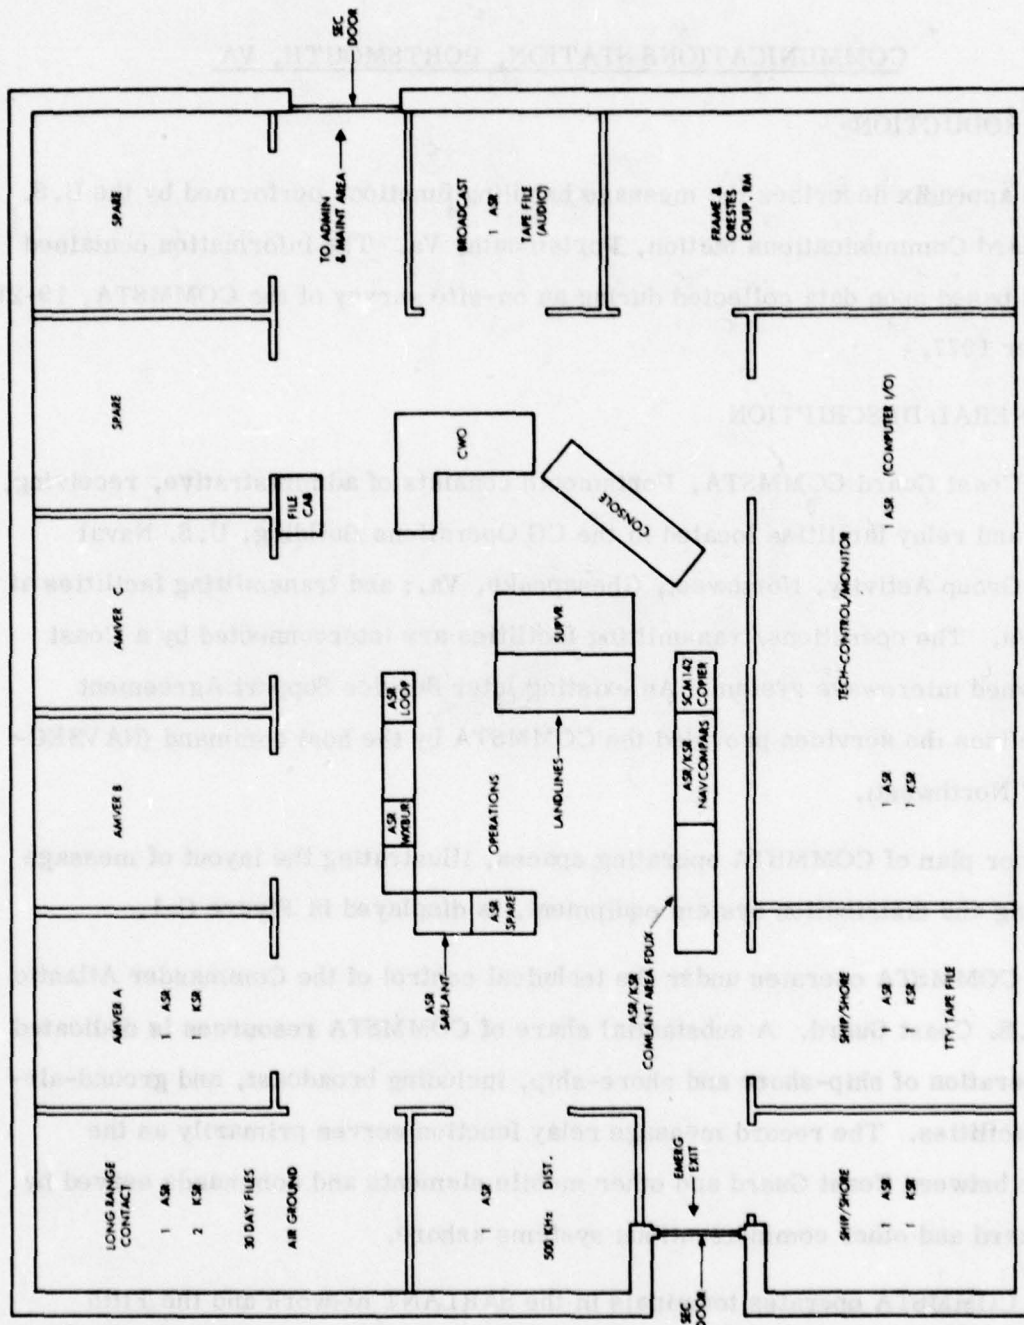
COMMSTA Operations Spaces - Floor Plan
